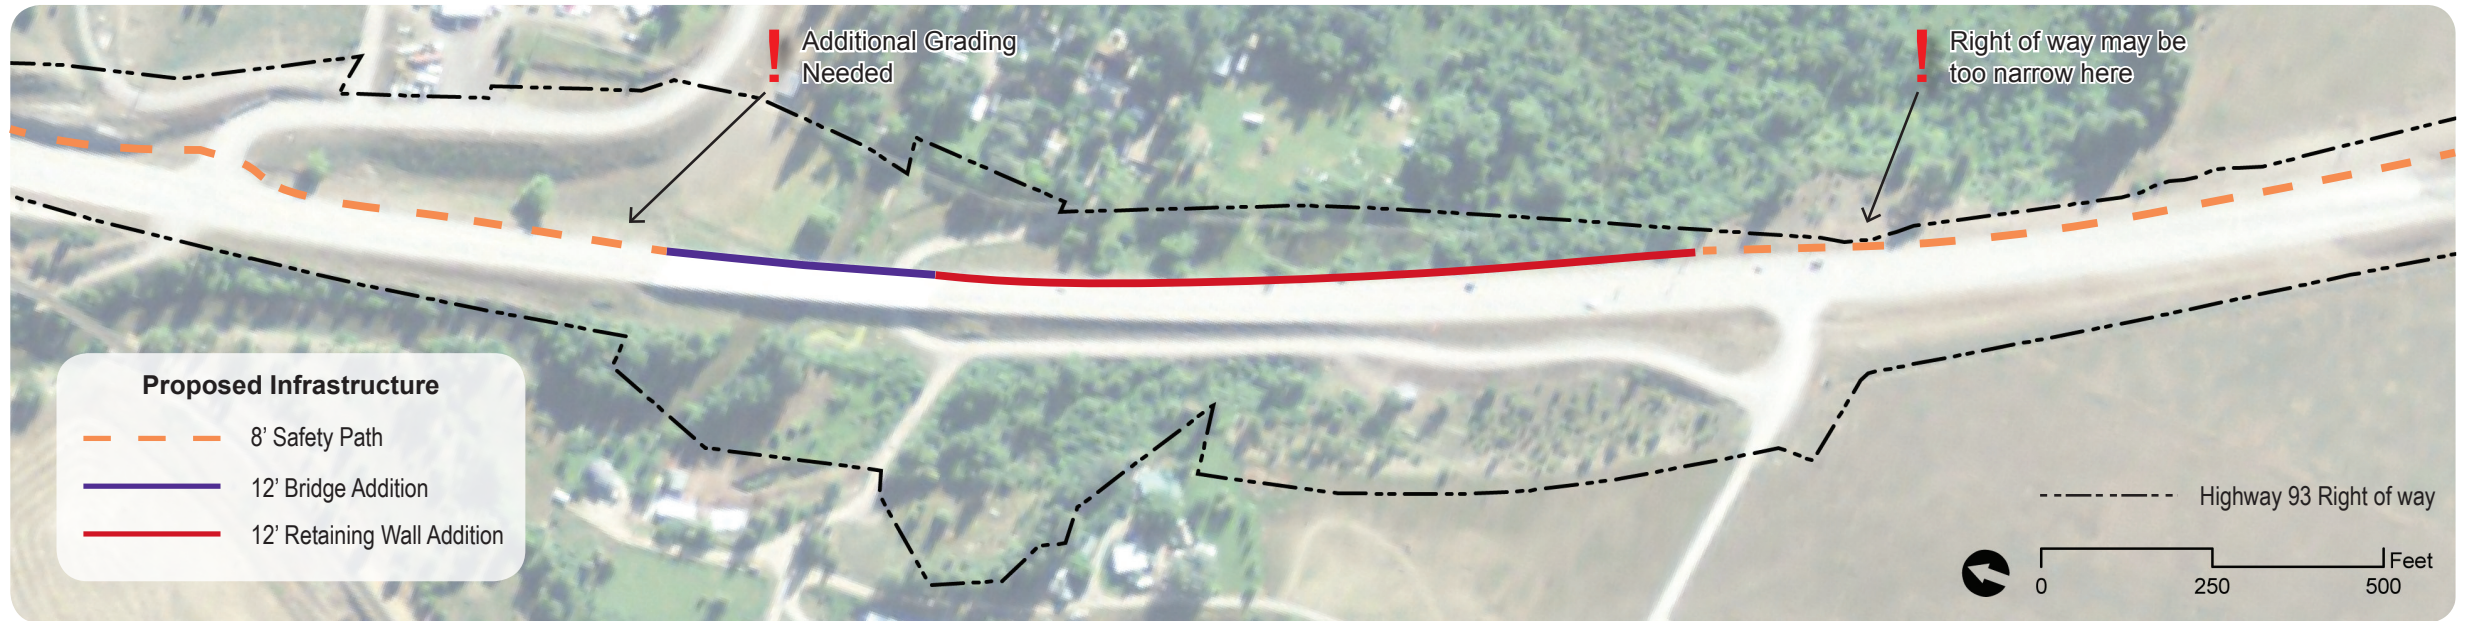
Pedestrian Retrofit: Highway 93 Bridge and Retaining Wall Map
